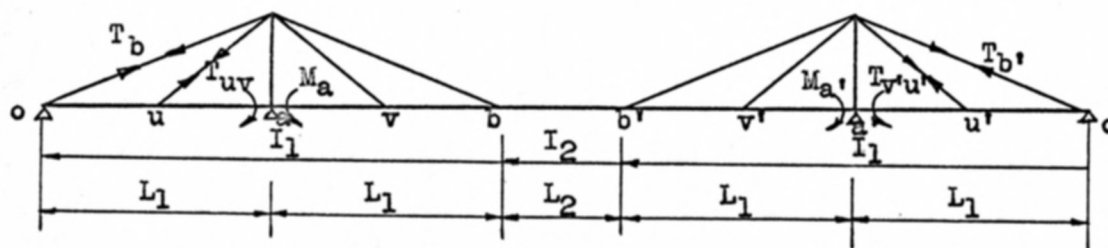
The cable-stiffened girder bridge showing the chosen redundant constraints.
